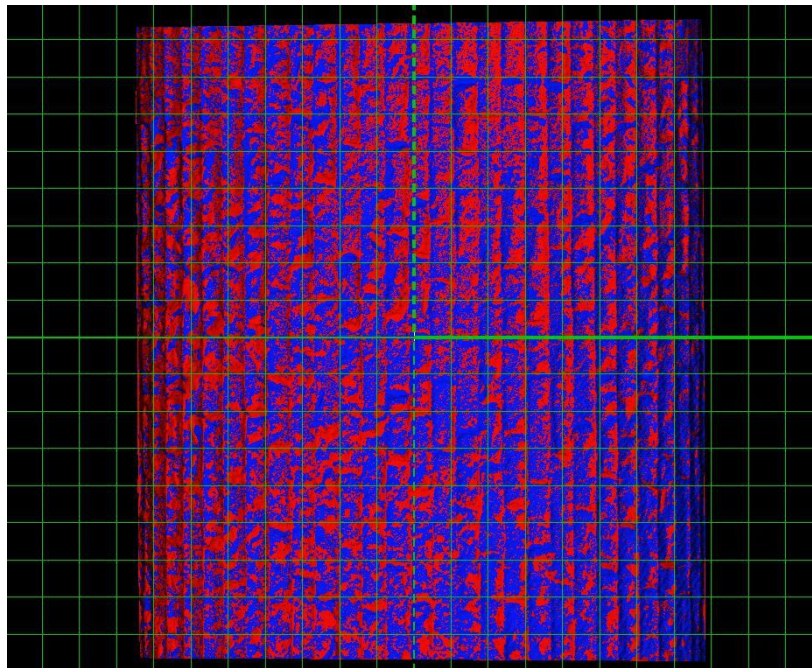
Grid Spacing along Bridge Arch Example (spacing 0.5m).
